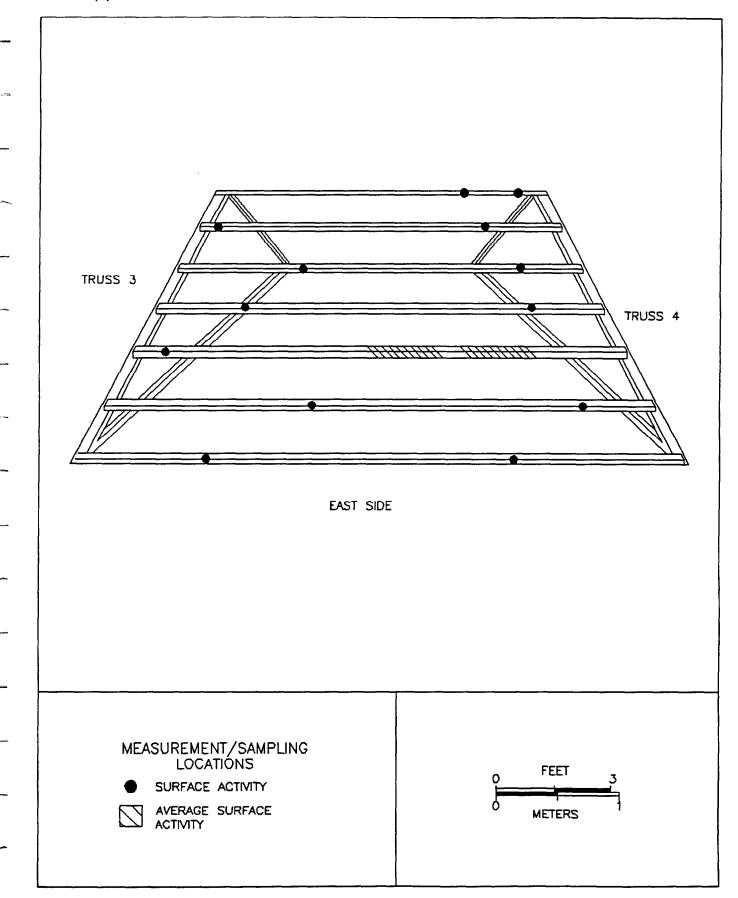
Building 3, Bay 3, East — Measurement and Sampling Locations
